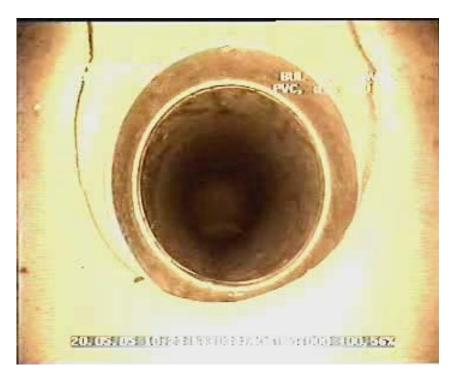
Cracks in the wall of a PVC sewer main at a lateral joint due to uneven soil compaction and the lateral acting as a lever
